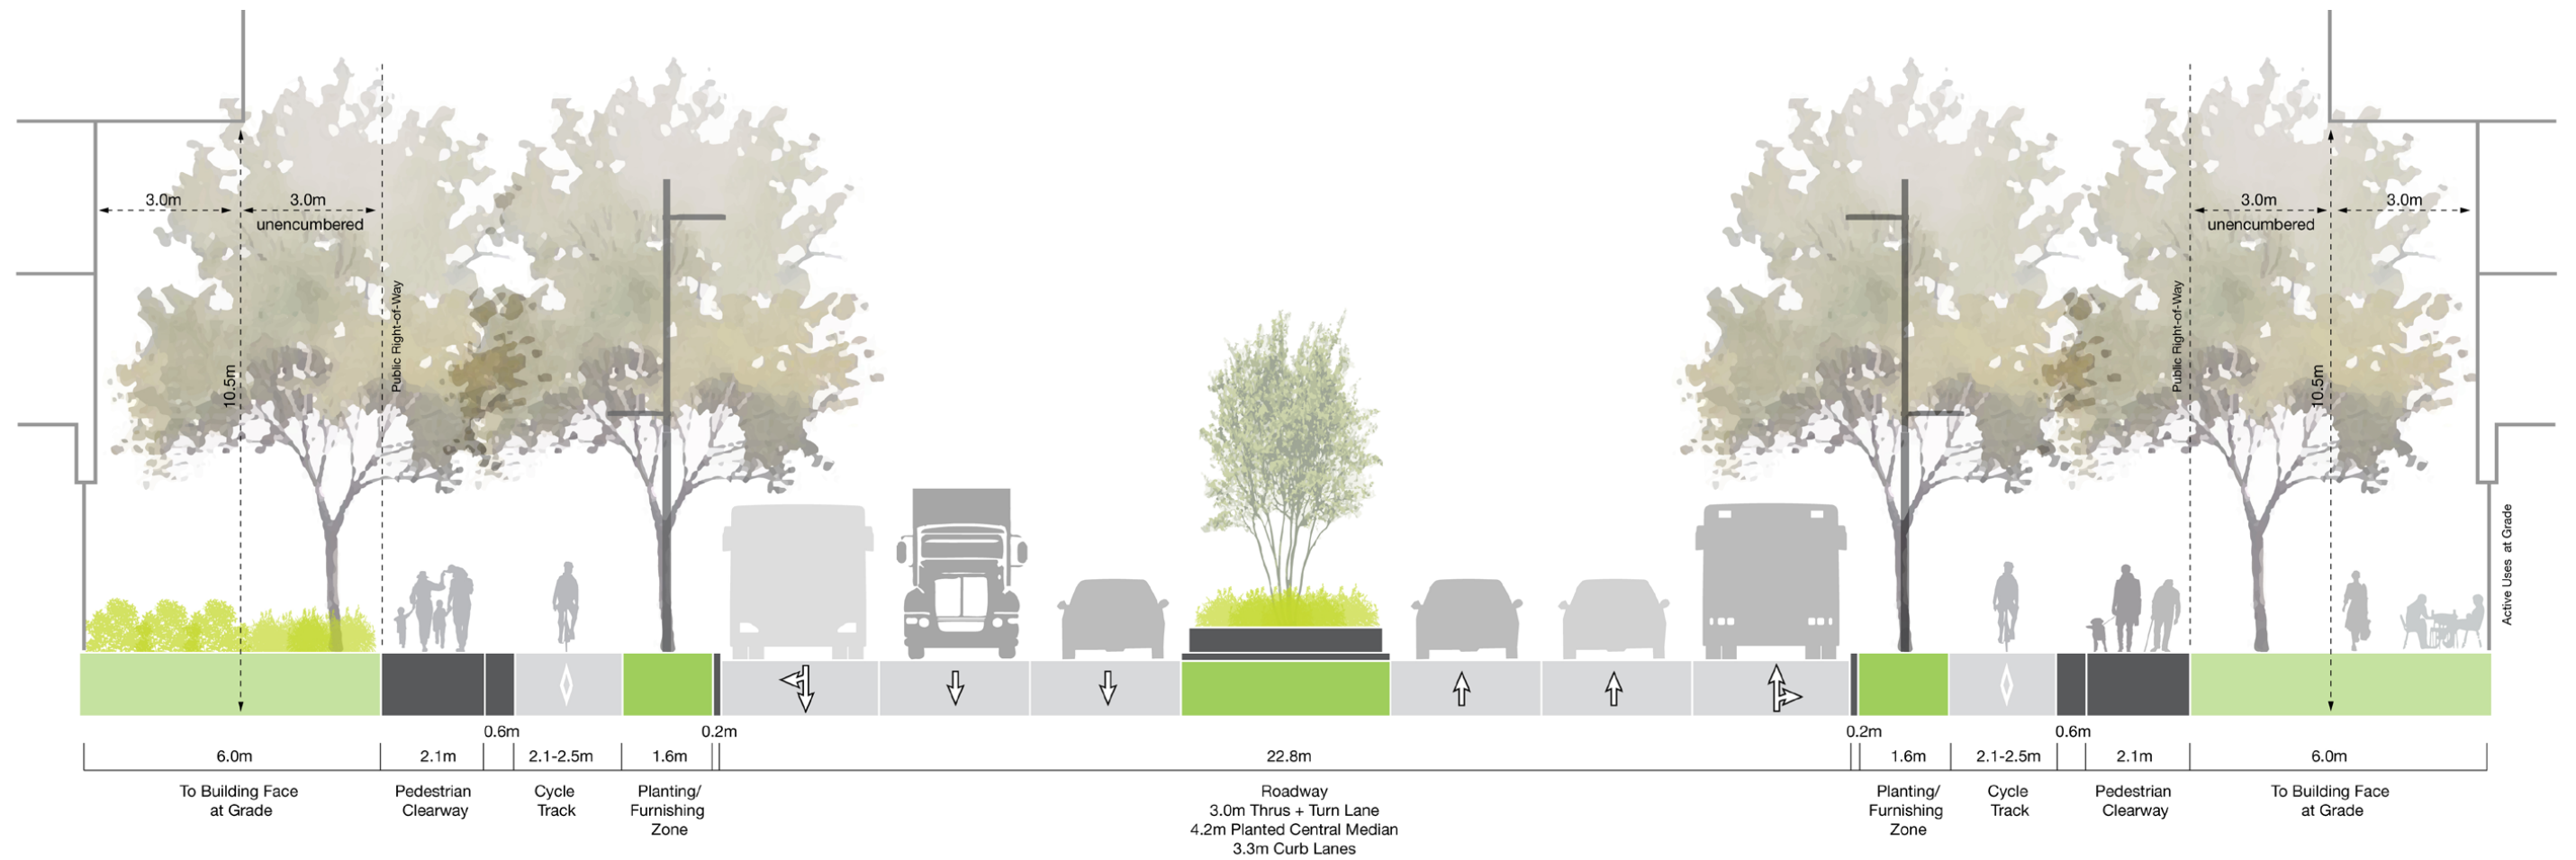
McCowan Road Cross Section 36m ROW
